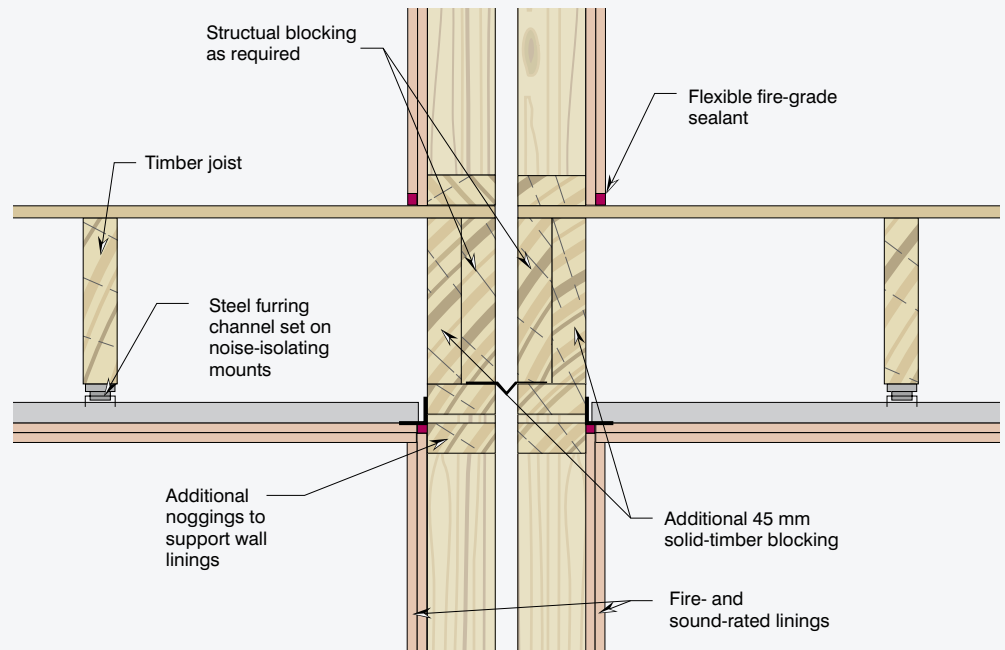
Typical junction of elements with the same FRL – fire-rated floors abutting fire-rated walls – elevation view.
